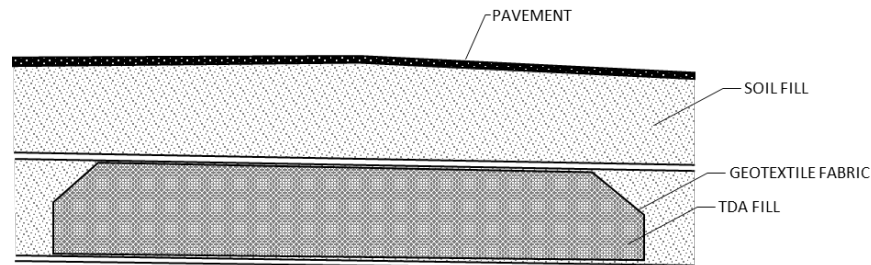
Typical cross-section of embankment (redrawn from Tandon et al. 2007).
